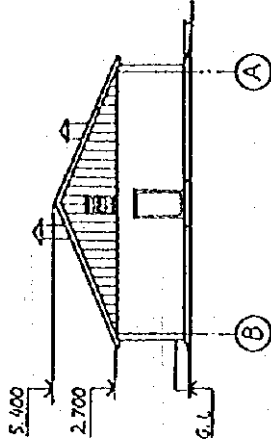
Pig Farrowing/Pregnant Sow Barn Construction Plan
